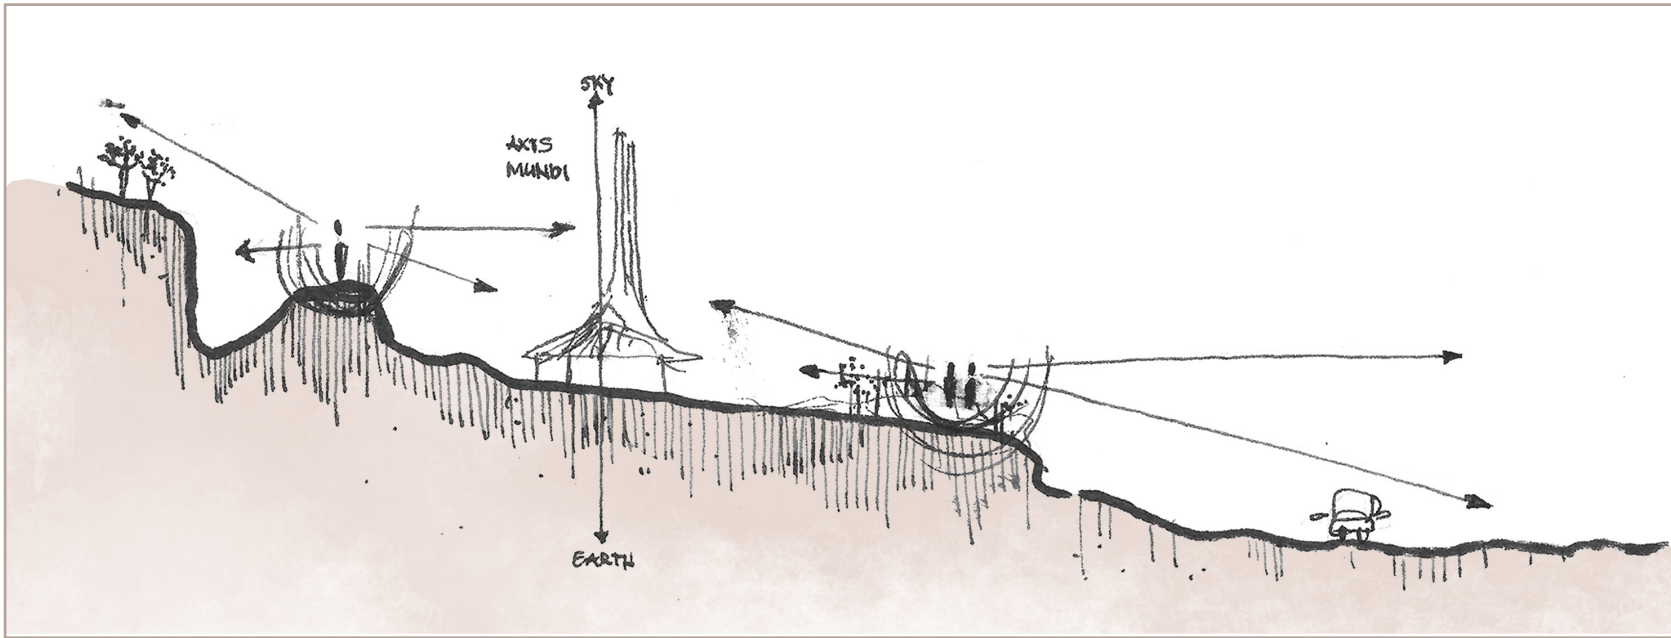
Observed site section indicating lookout points from the north of the proposed site. Not to scale.
